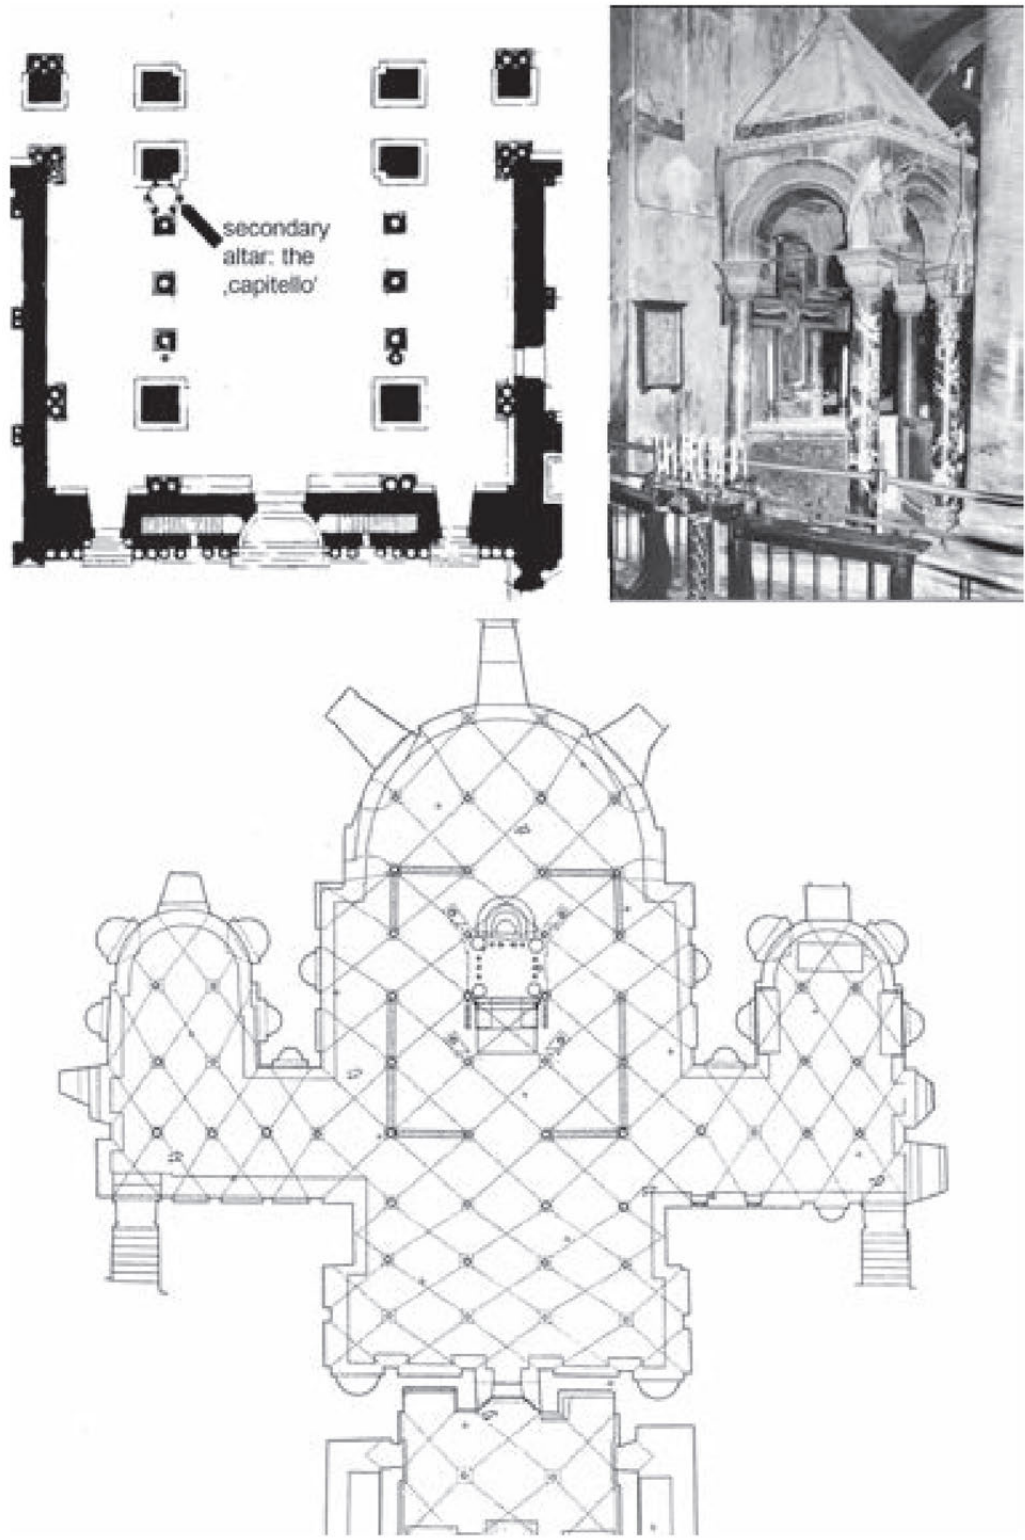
Venice, Basilica of San Marco: ground plans of the nave and the crypt, the so-called 'capitello' (photo and ground plans author after Otto DEMUS)
